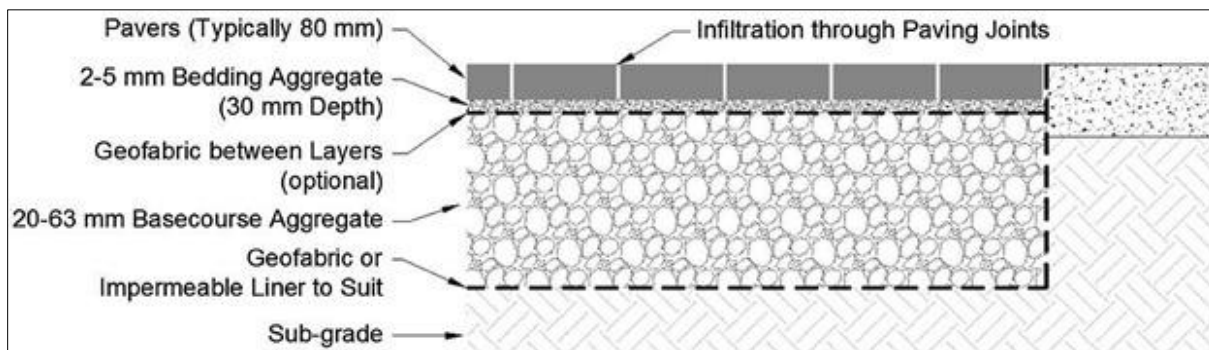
Typical permeable pavement structure (Boogaard, Lucke, and Beecham 2014)
